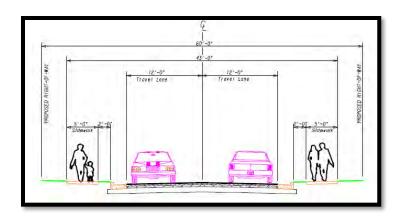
Proposed Typical Section – Alternative 5A – North Commons Street Extension
